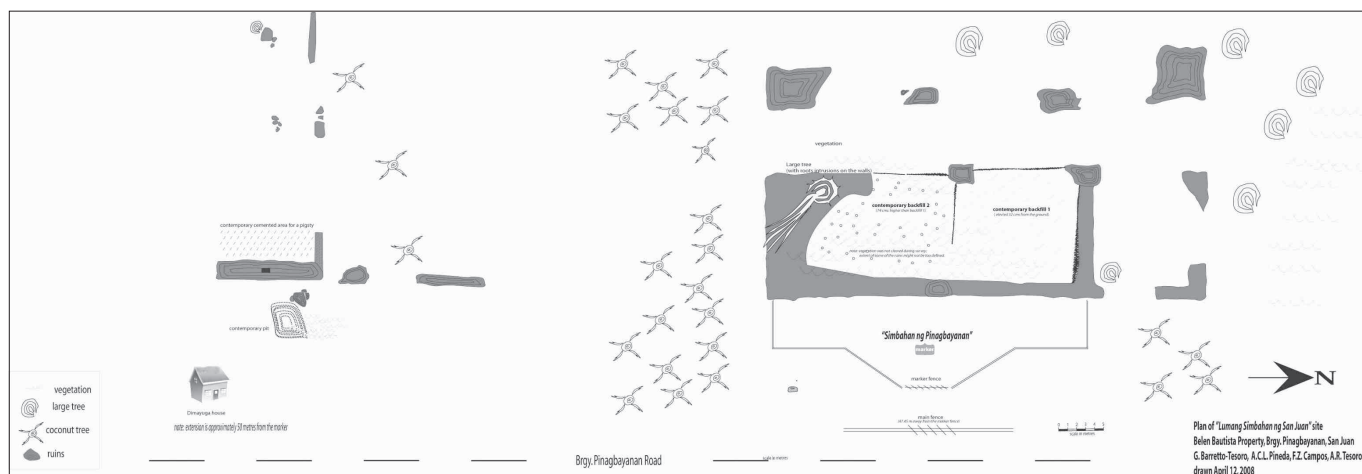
Plan of the Old Church of San Juan (right) and associated structure (left). Both plans scaled. Distance between structures not scaled (F. Campos).
